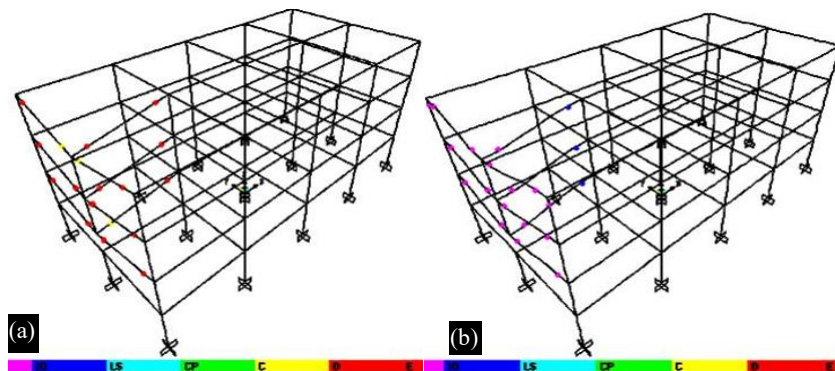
Deformed shape and hinge formation after removal of C2: (a) earlier section and (b) revised section.
